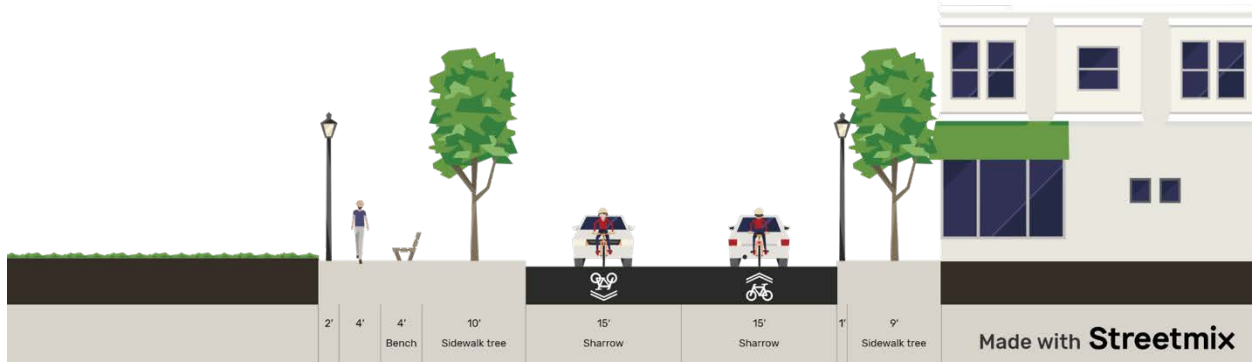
Proposed cross-section of Bulloch Street looking north. It includes a shared bike lane with a driveway. Bike sharrows will be added to the road. It also suggests restricting on-street parking; the drive lanes will become wider. It proposes to add street light infrastructure along the housing units. Diagram created in Streetmix by EC, 2022.
